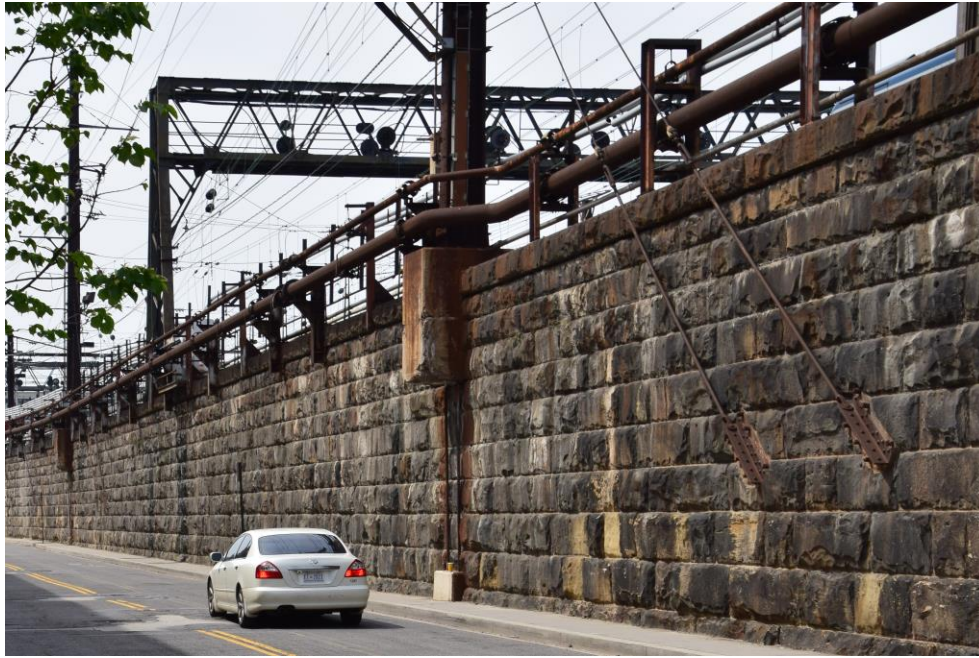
Photograph of Signal Bridge J, between L Street NE and M Street NE. The lower half of a single catenary and a portion of the eastern retaining wall are visible in the foreground. Source: BBB, 2017.
